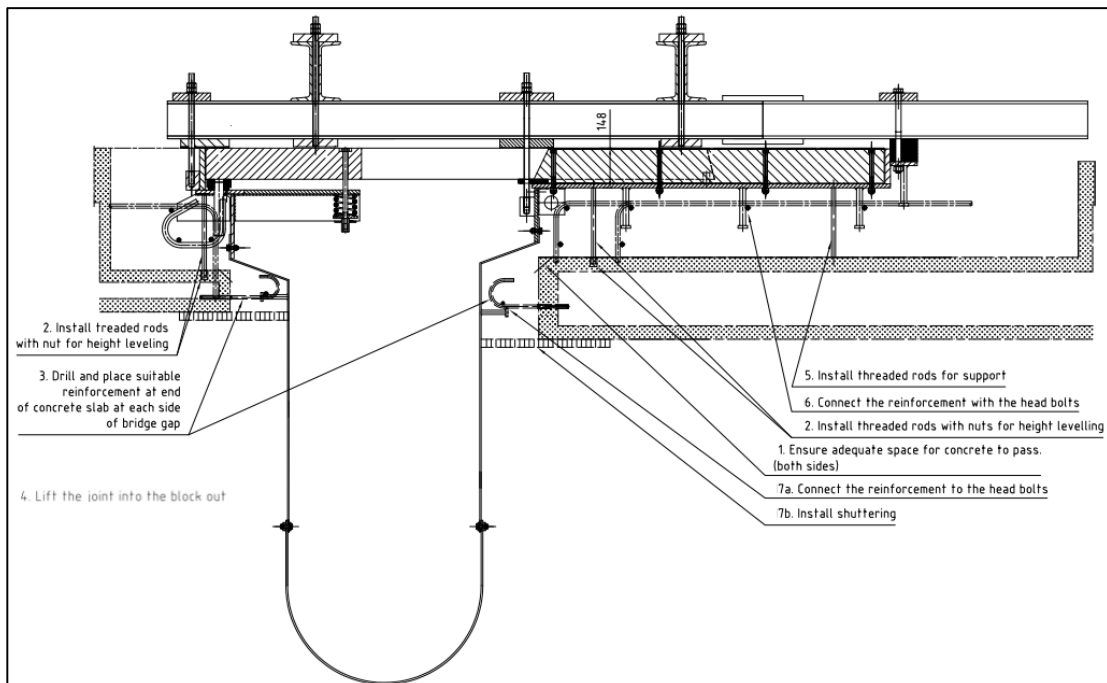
Steps in the installation of each sliding finger joint following connection of drainage channel
